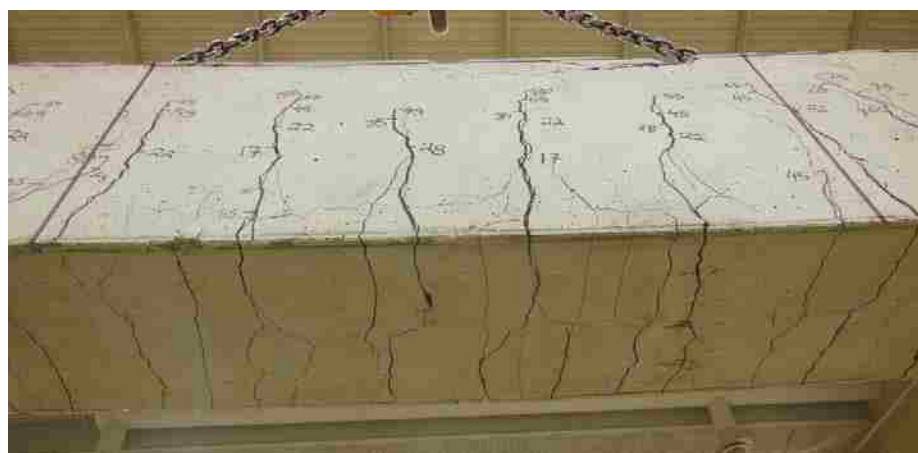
Crack Pattern of Specimen REF-60 (Bottom View)
